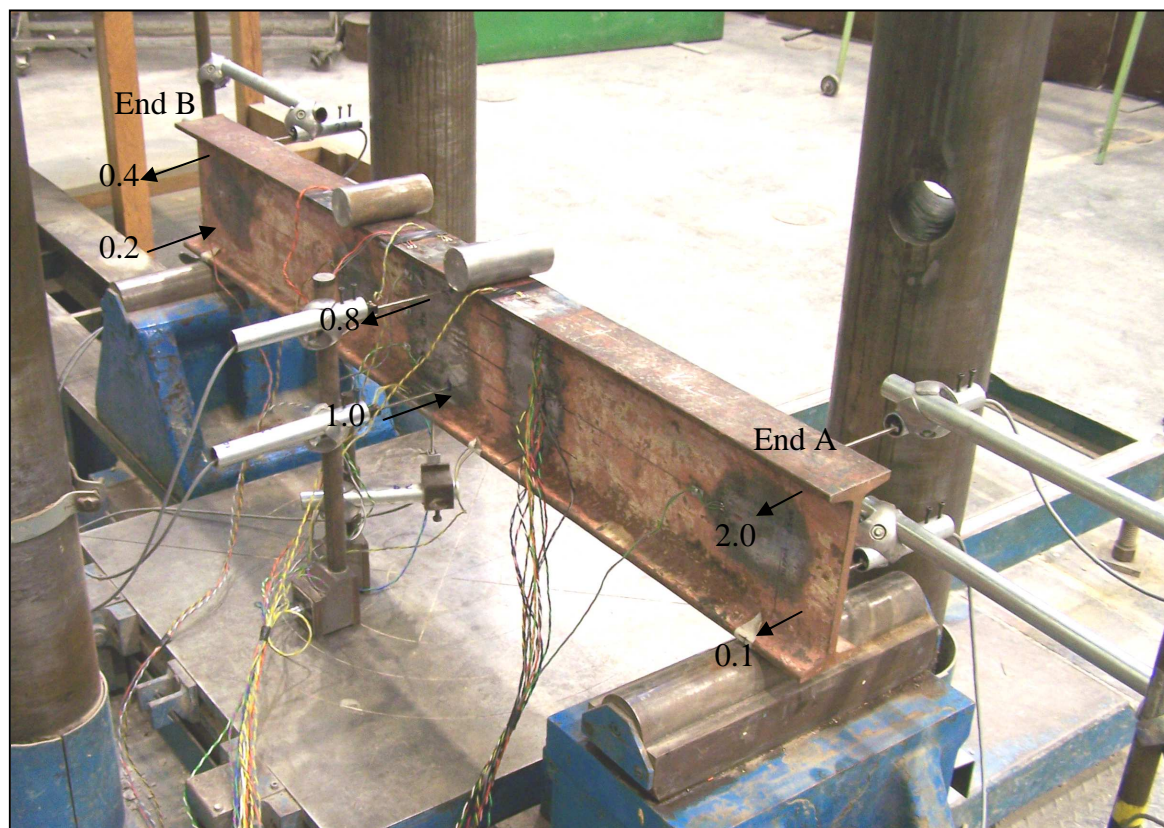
Loading arrangement of the Albert Hall beam test. Deflections noted are in mm and occurred under a load of 90kN.
